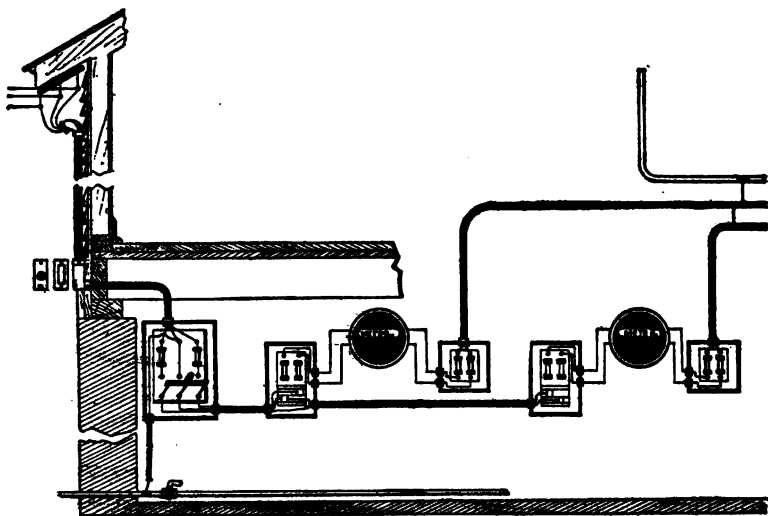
,246.—Two family house meter board arrangement as used throughout Connecticut; note method of service pipe and meter loop arrangement.
